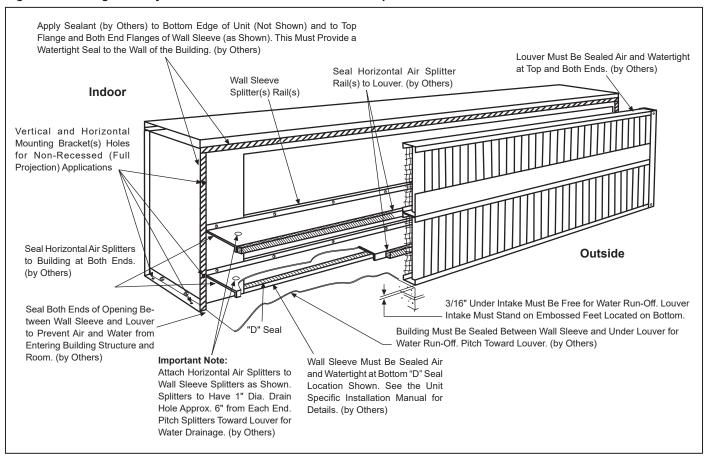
Recessed Wall Sleeve - Direct Sealing Wall Sleeve to Louver
